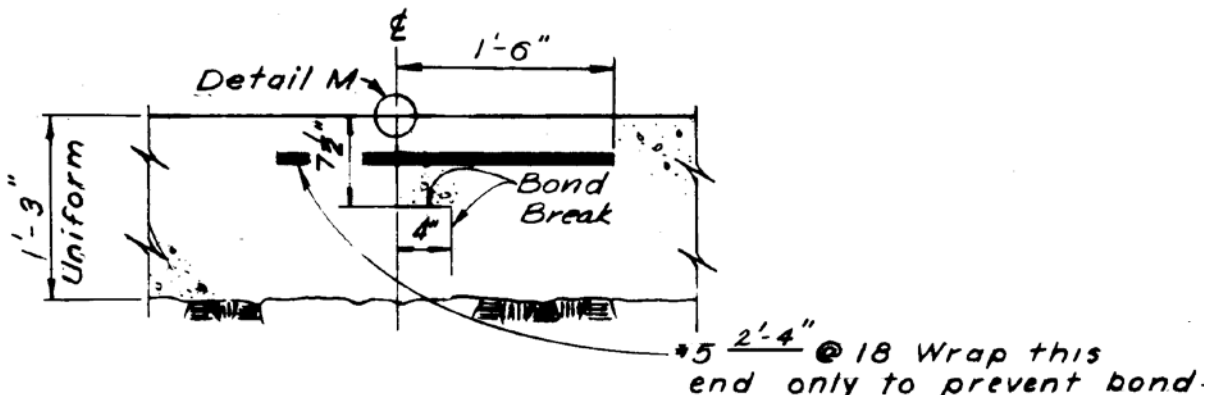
Longitudinal Contraction Joint at Centerline [D-10]
